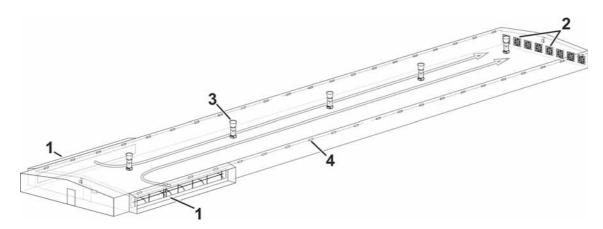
Example of a ventilation system (tunnel ventilation)
